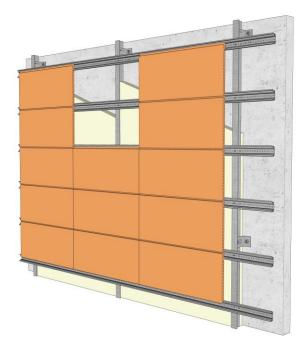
Tempio[®] FK kit with horizontal profiles. General view.
